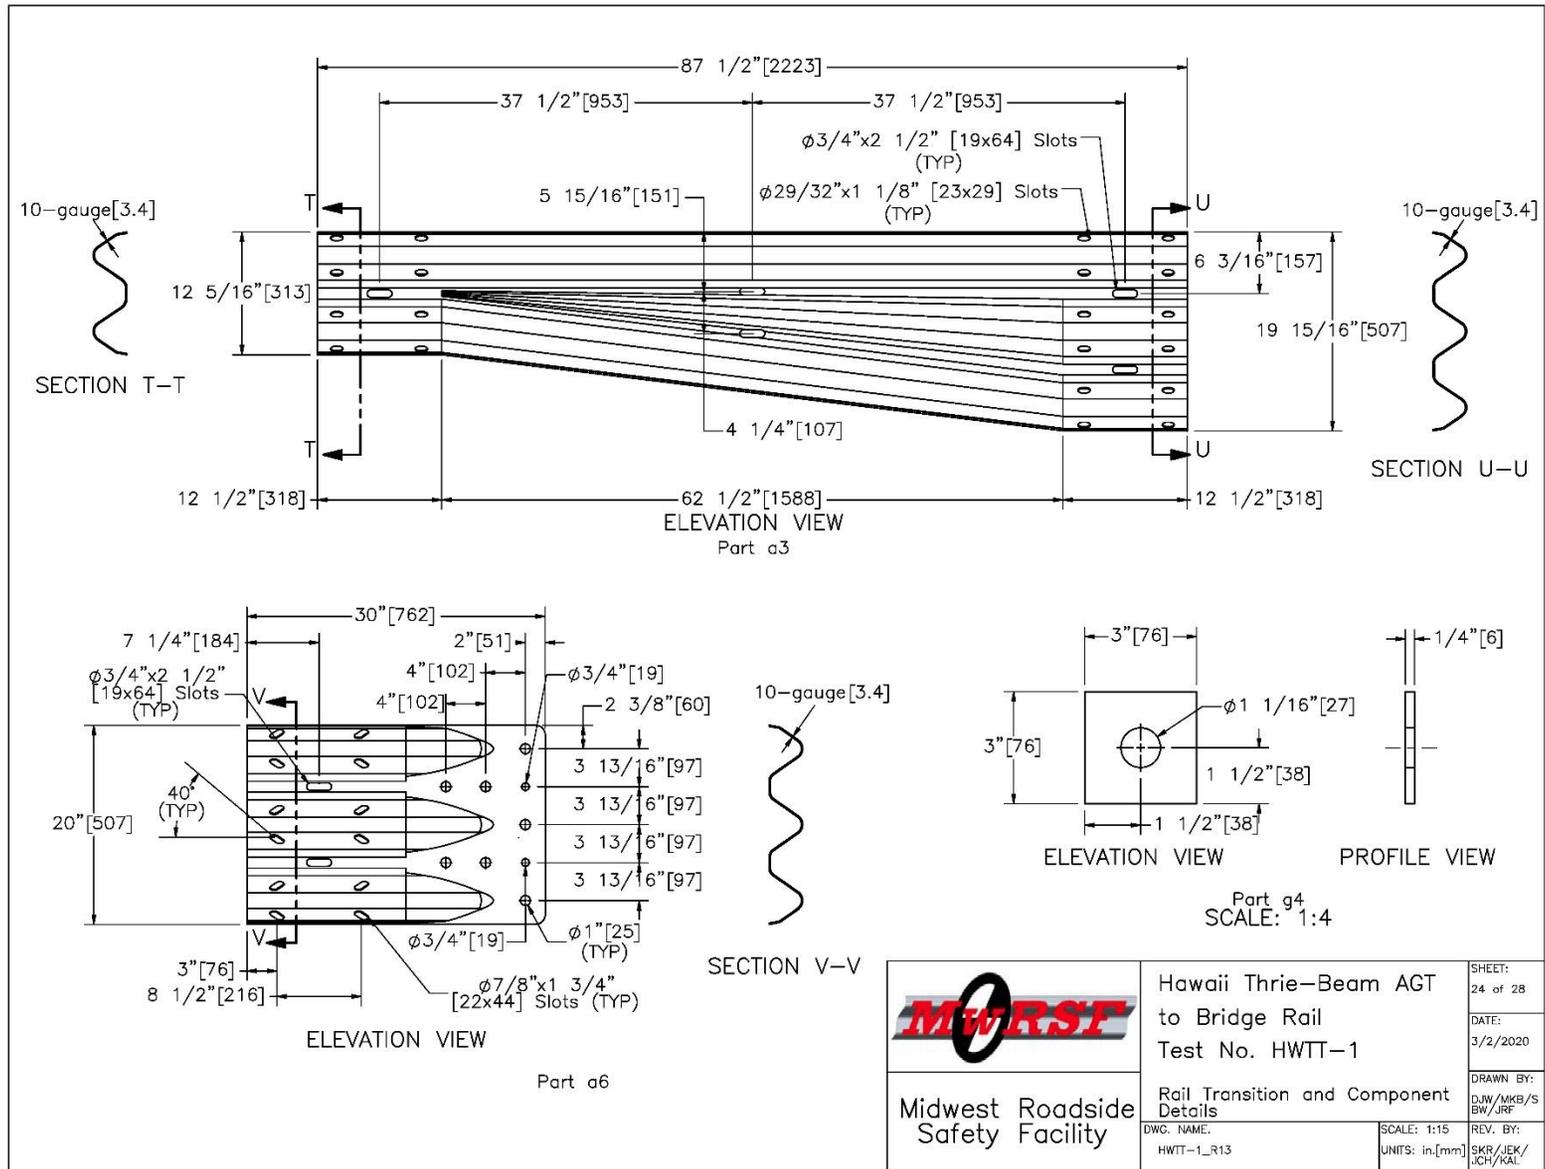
Asymmetric Transition Rail and Terminal Connector Details, Test Nos. HWTT-1 and HWTT-2
